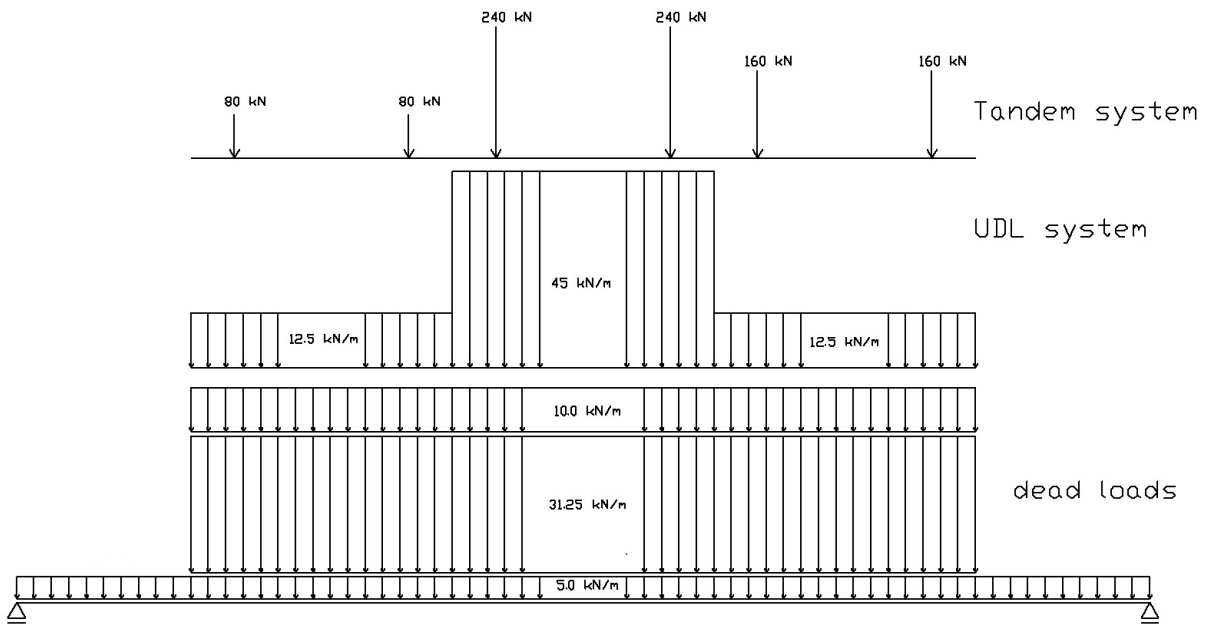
Characteristic loads applied to the composite steel concrete deck
